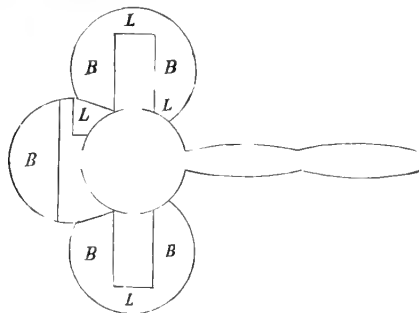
Plan of Ighulik house. (From Parry II, p. 500.)
